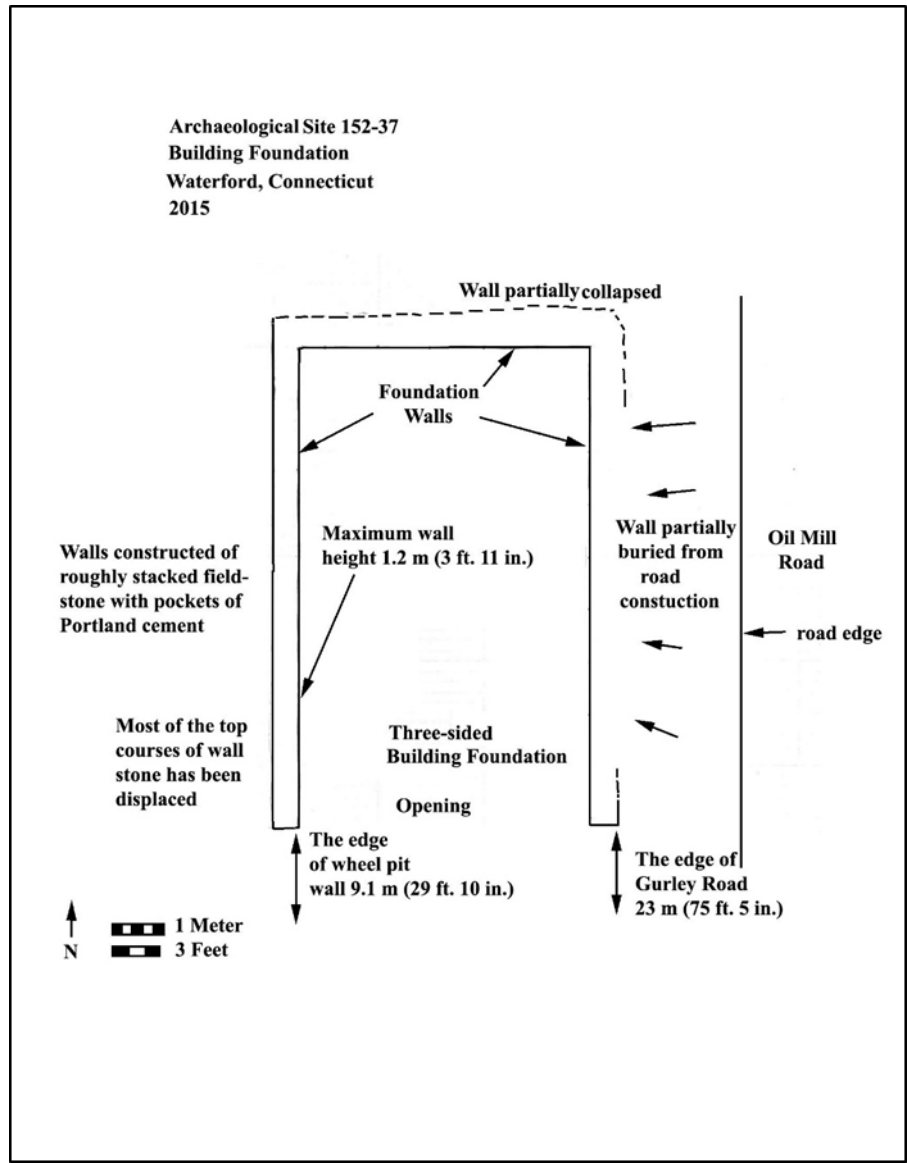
Sketch of building foundation at 57/59 Gurley Road (Archaeological Site 152-37).
